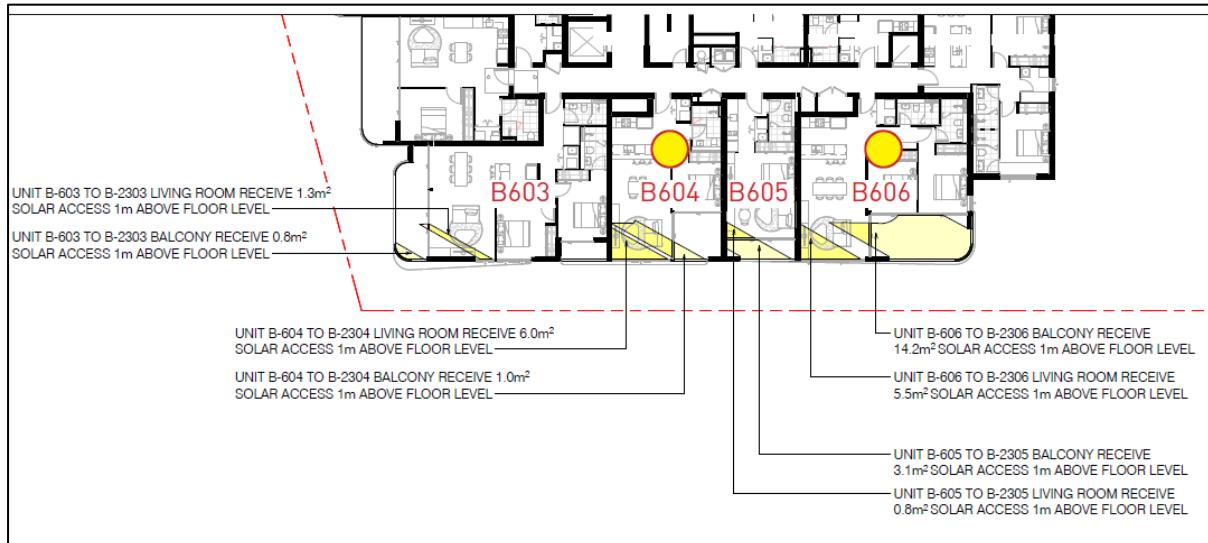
Solar penetration diagram; Building B at 9:15am 21st June (Source: PTW Architects)
